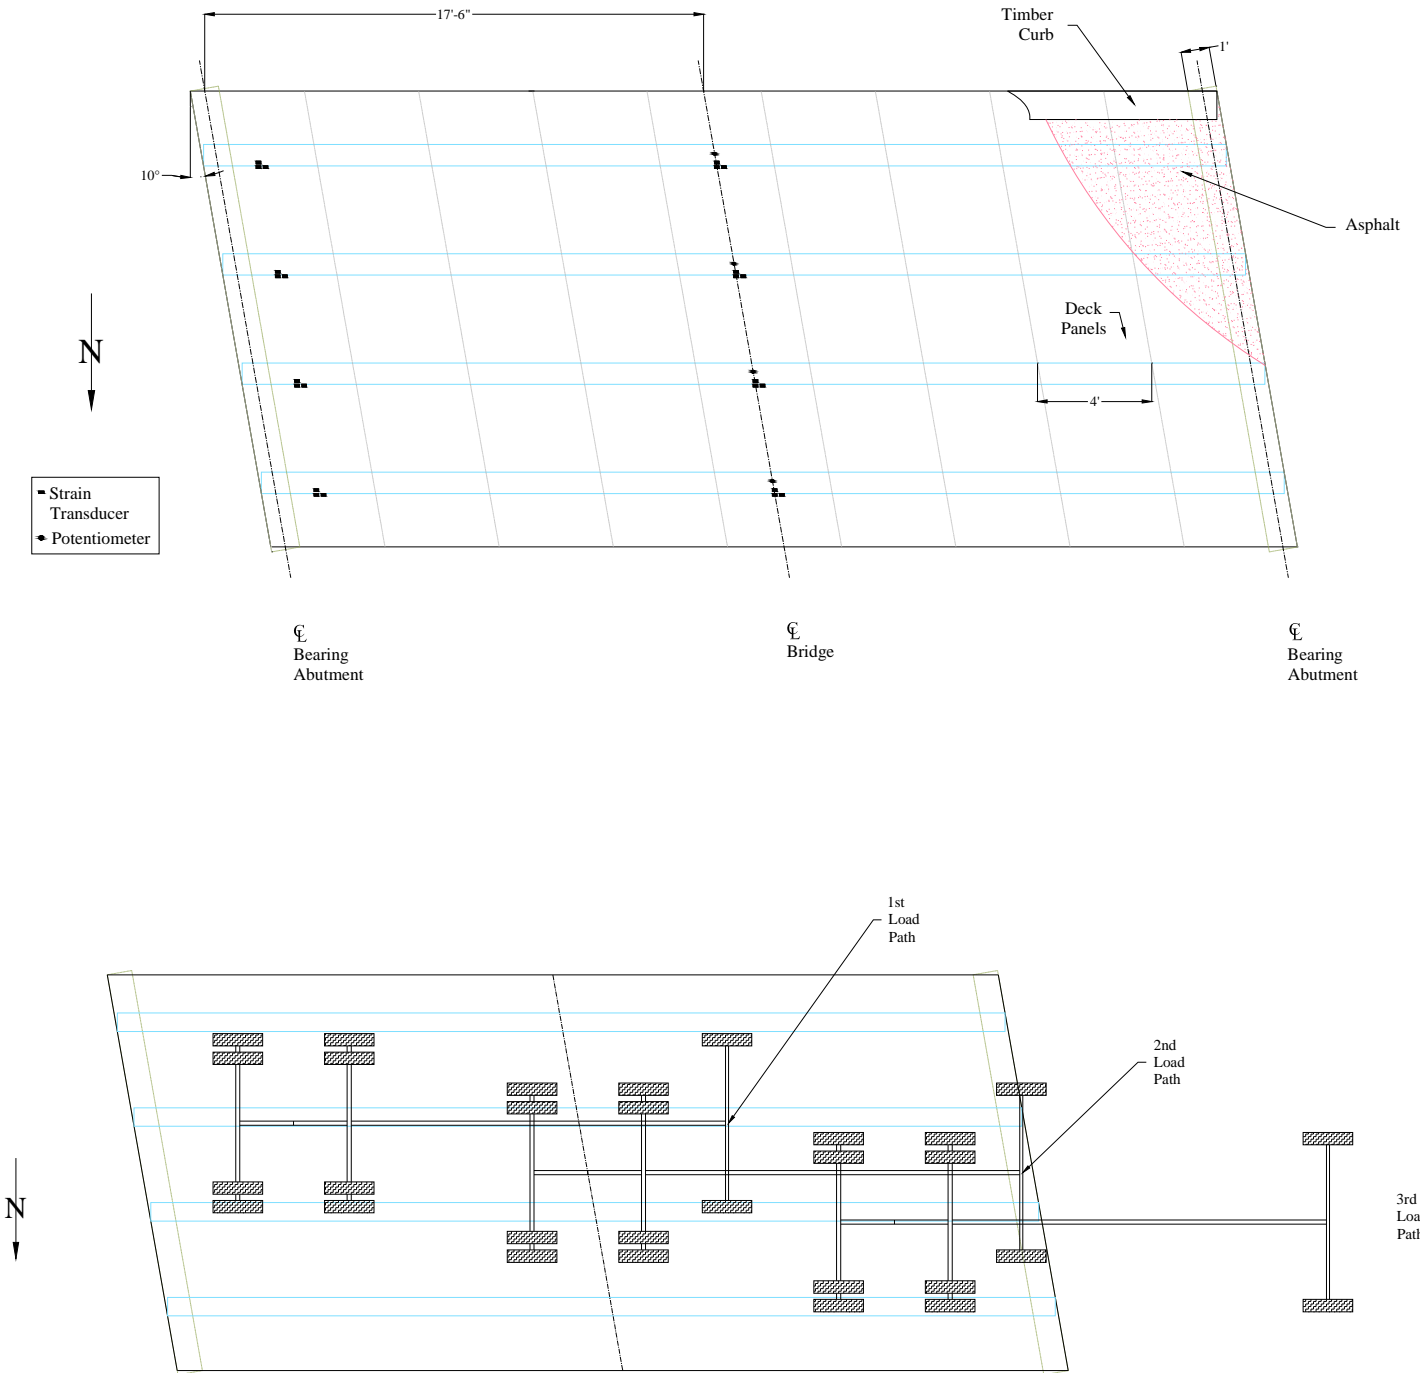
Instrumentation and Load Paths of Trapper Creek Bridge
